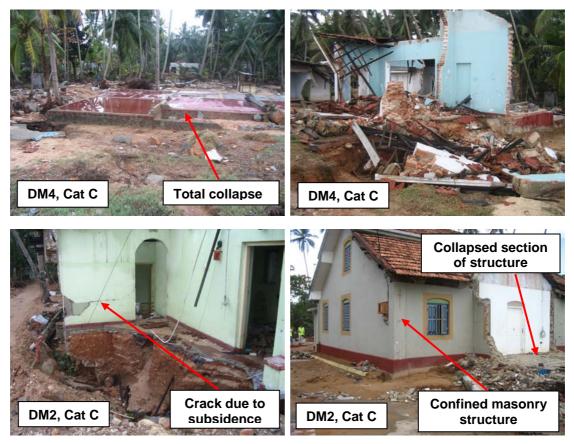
Direct structural damage to masonry houses in Kahawa
